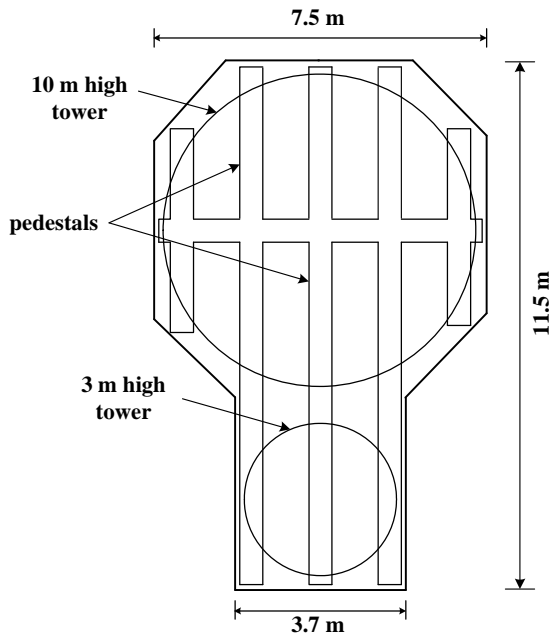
A Typical Plan of an Isolated Footing Carrying Towers
